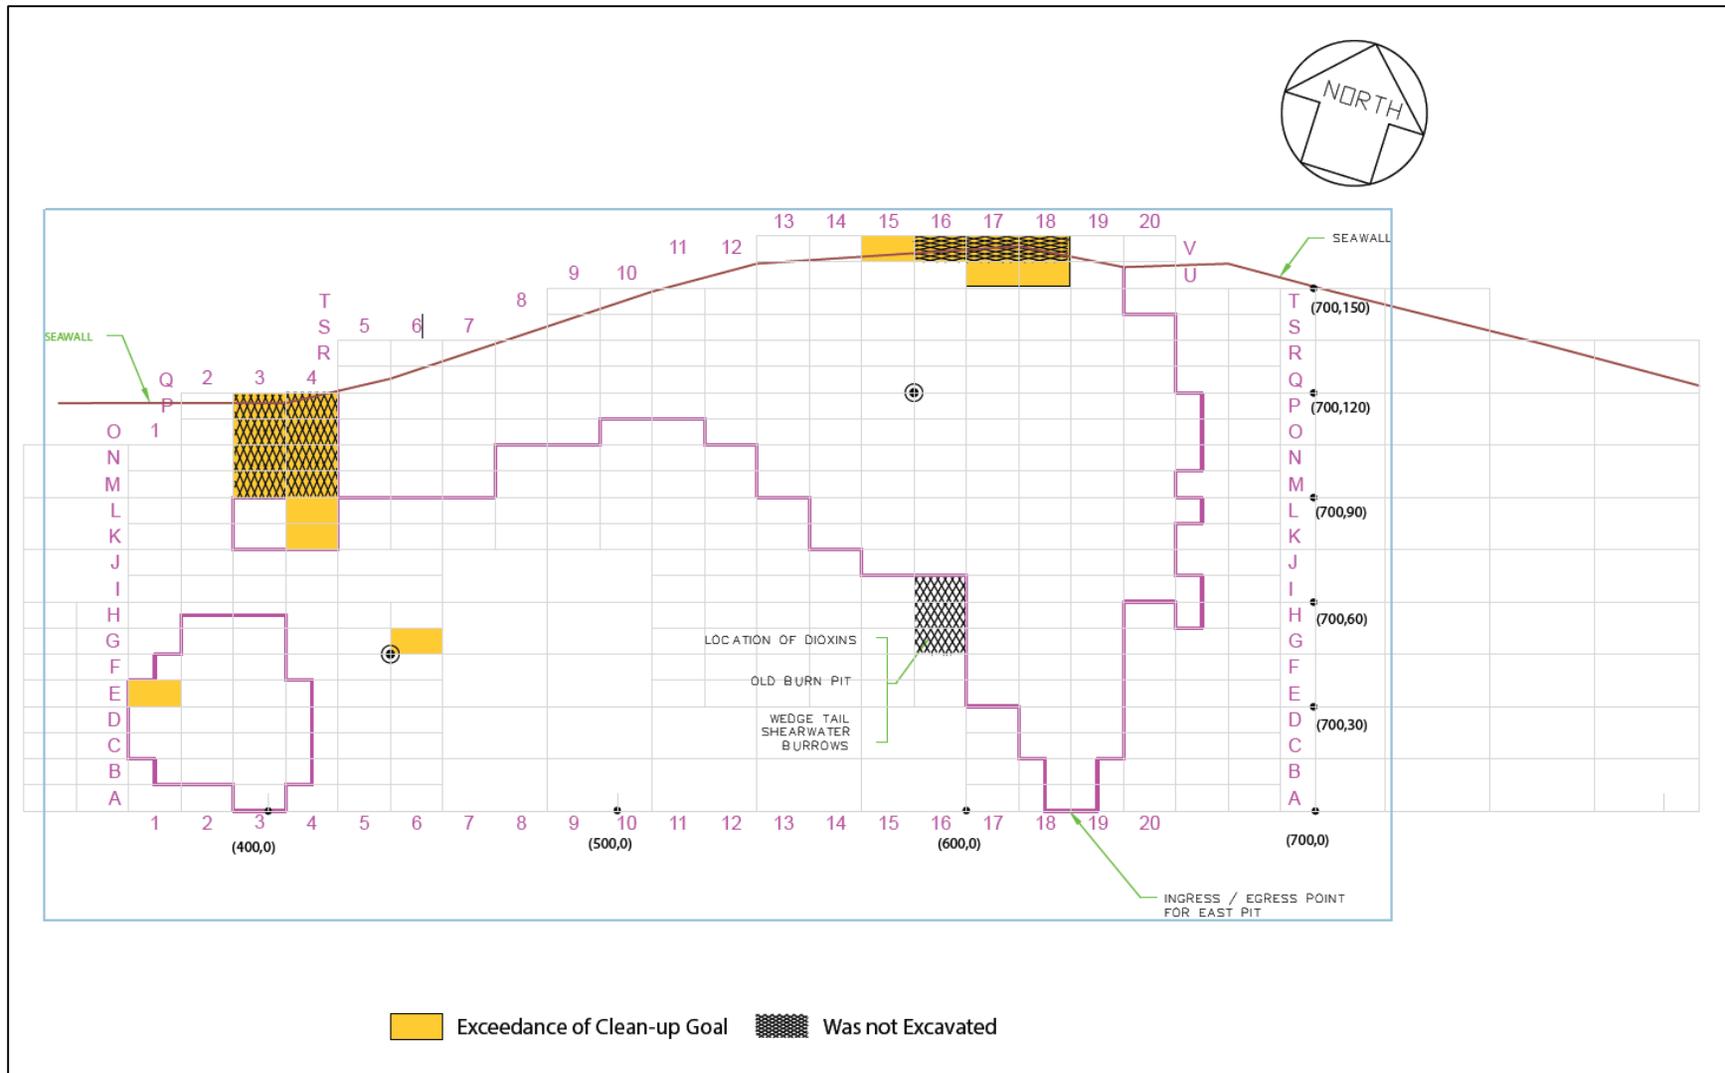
PCB Sampling Locations from 2002 PCB Cleanup
